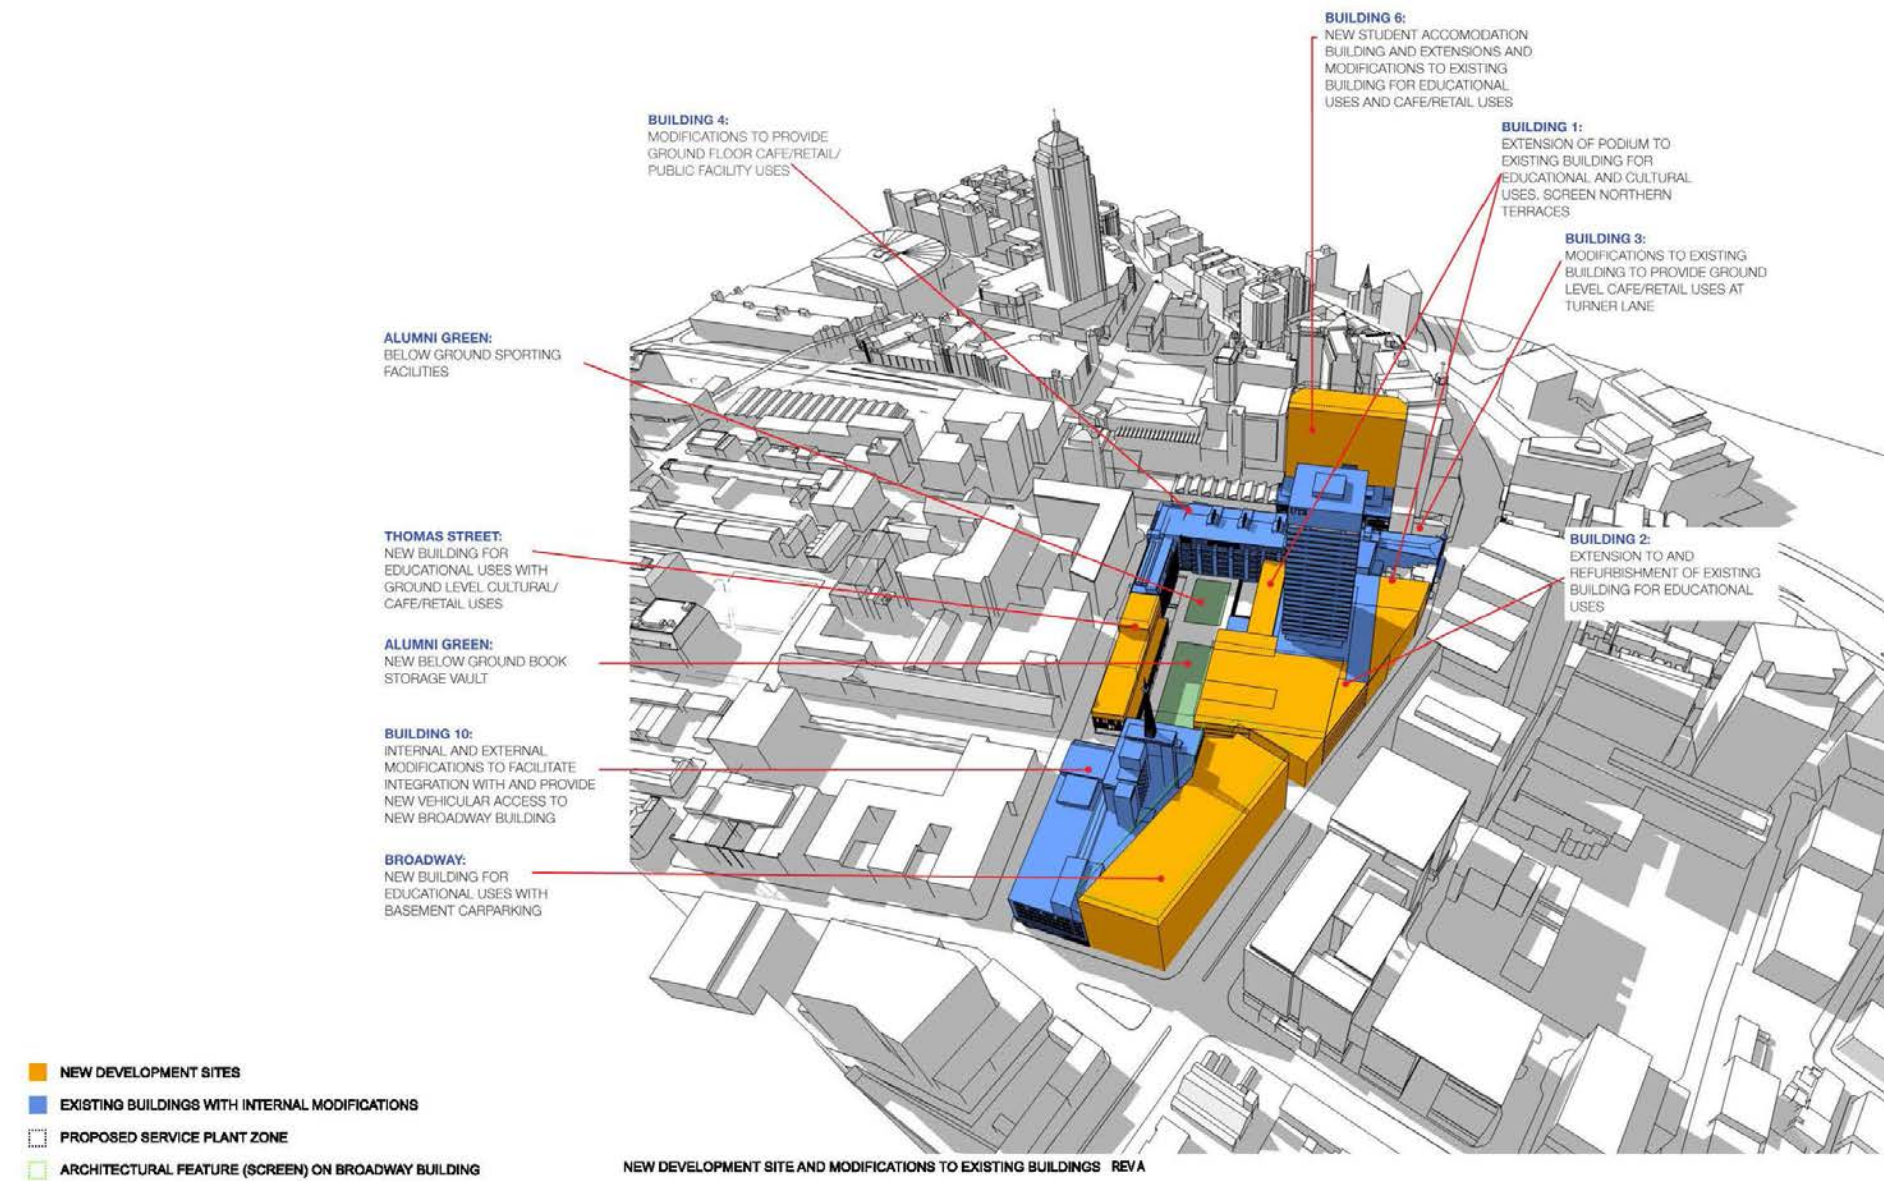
3D Model of approved concept plan (Source: BVN, DCM and JBA)
